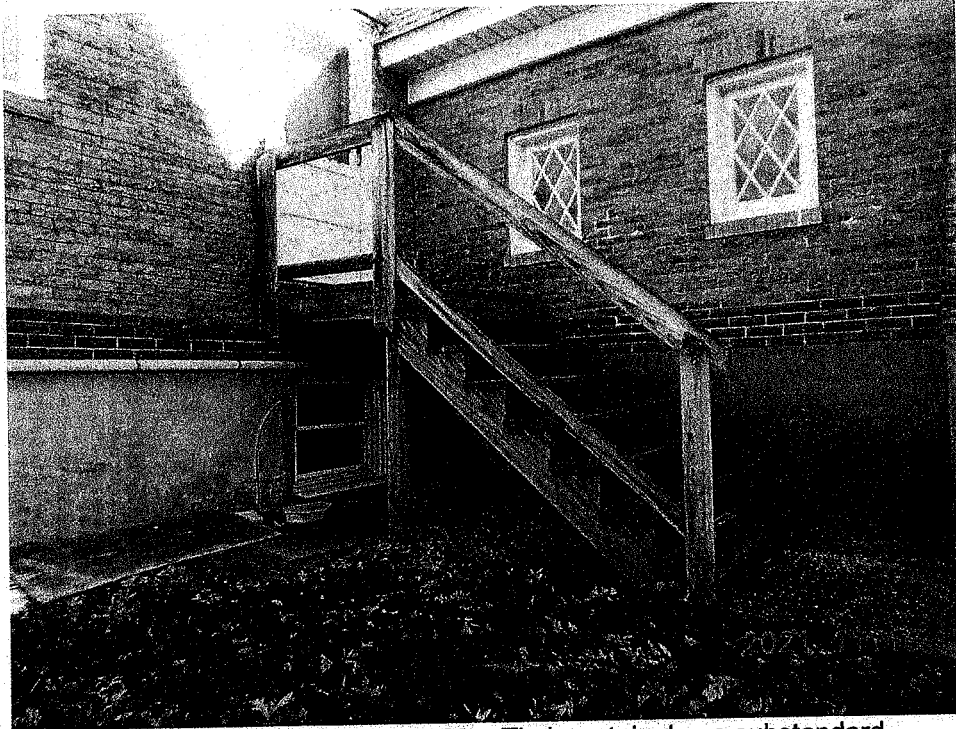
Routine Repair 29 – Timber stairs have substandard guard/handrail – Site, Grid F-G/6
